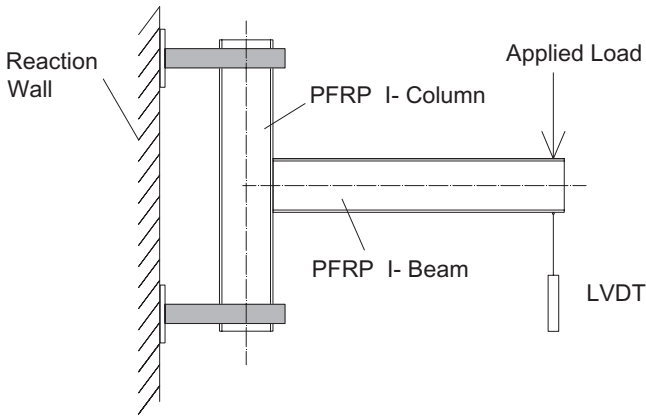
Exterior PFRP beam-to-column bonded connection setup. Source: Sanders et al. (1996).
